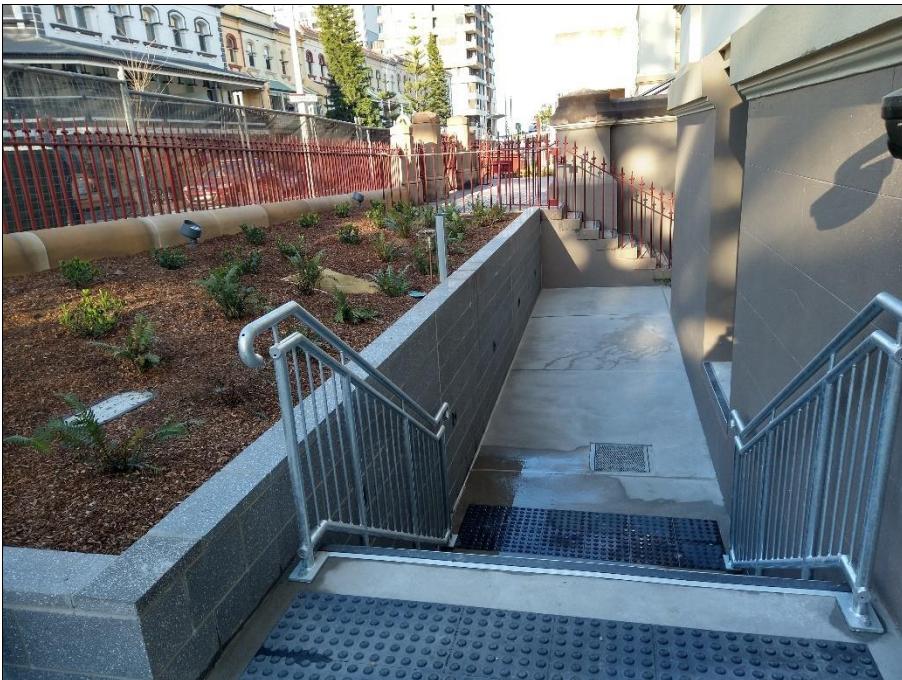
Looking east at garden bed and concrete footpath pavements along the northern side (front) of the central building (20 August 2021)
